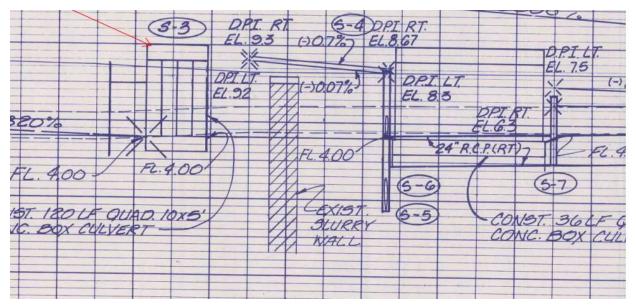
Plan Set of RT03460 Confirming Box Culvert
